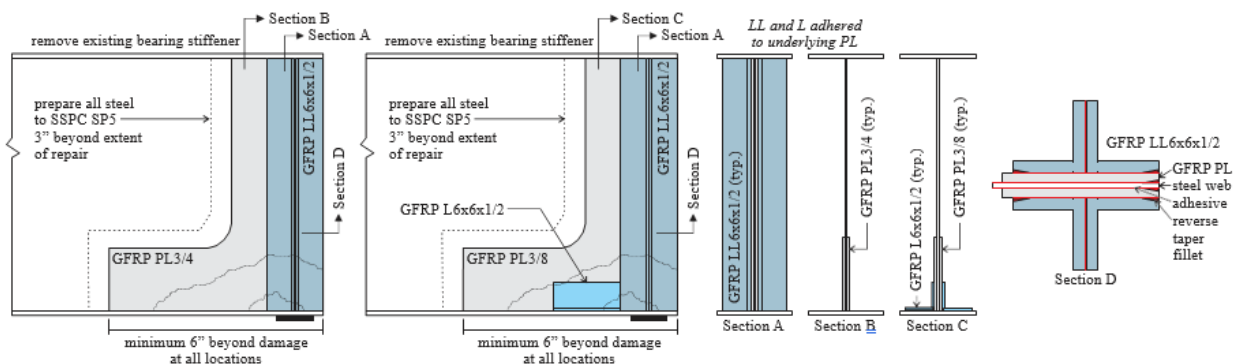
Adhesive Bonded FRP Repairs for Plate Girders
